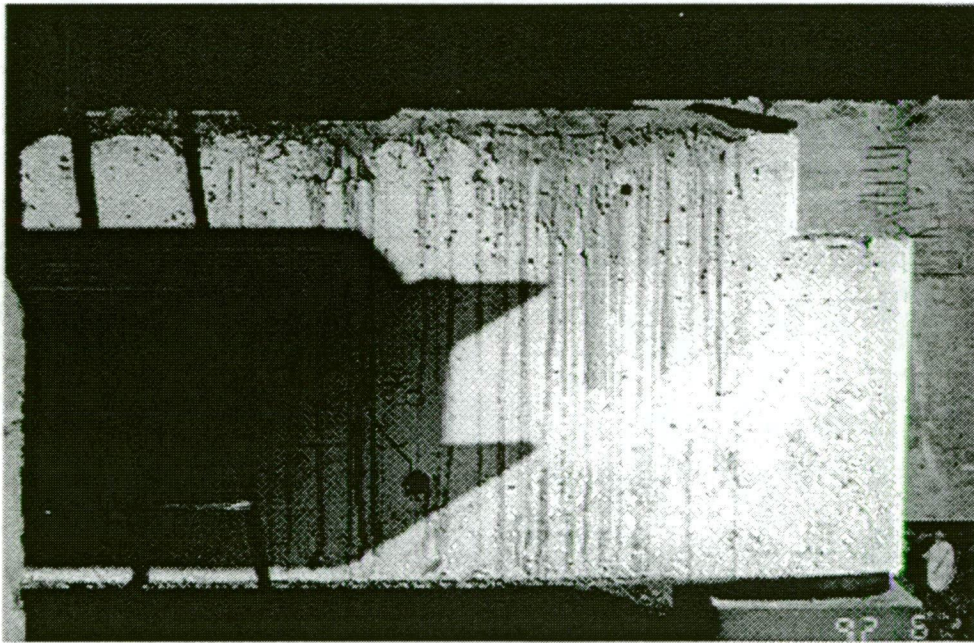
Flexural Beam Crack Patterns
